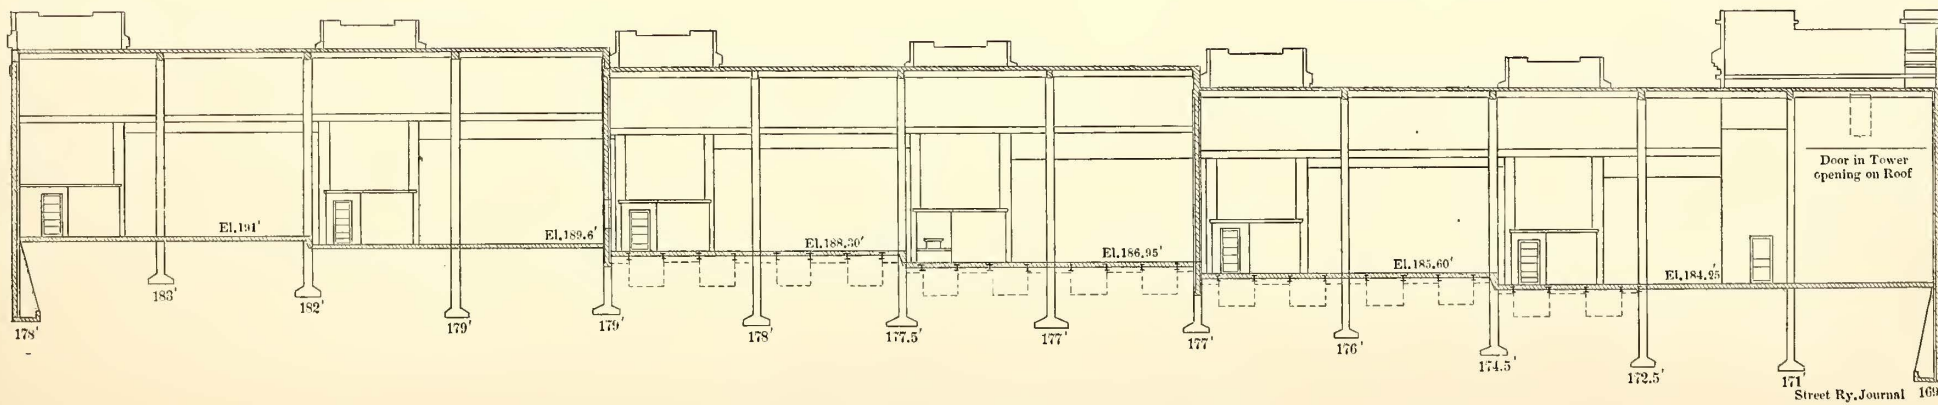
TRANSVERSE SECTION, LOOKING NORTH
